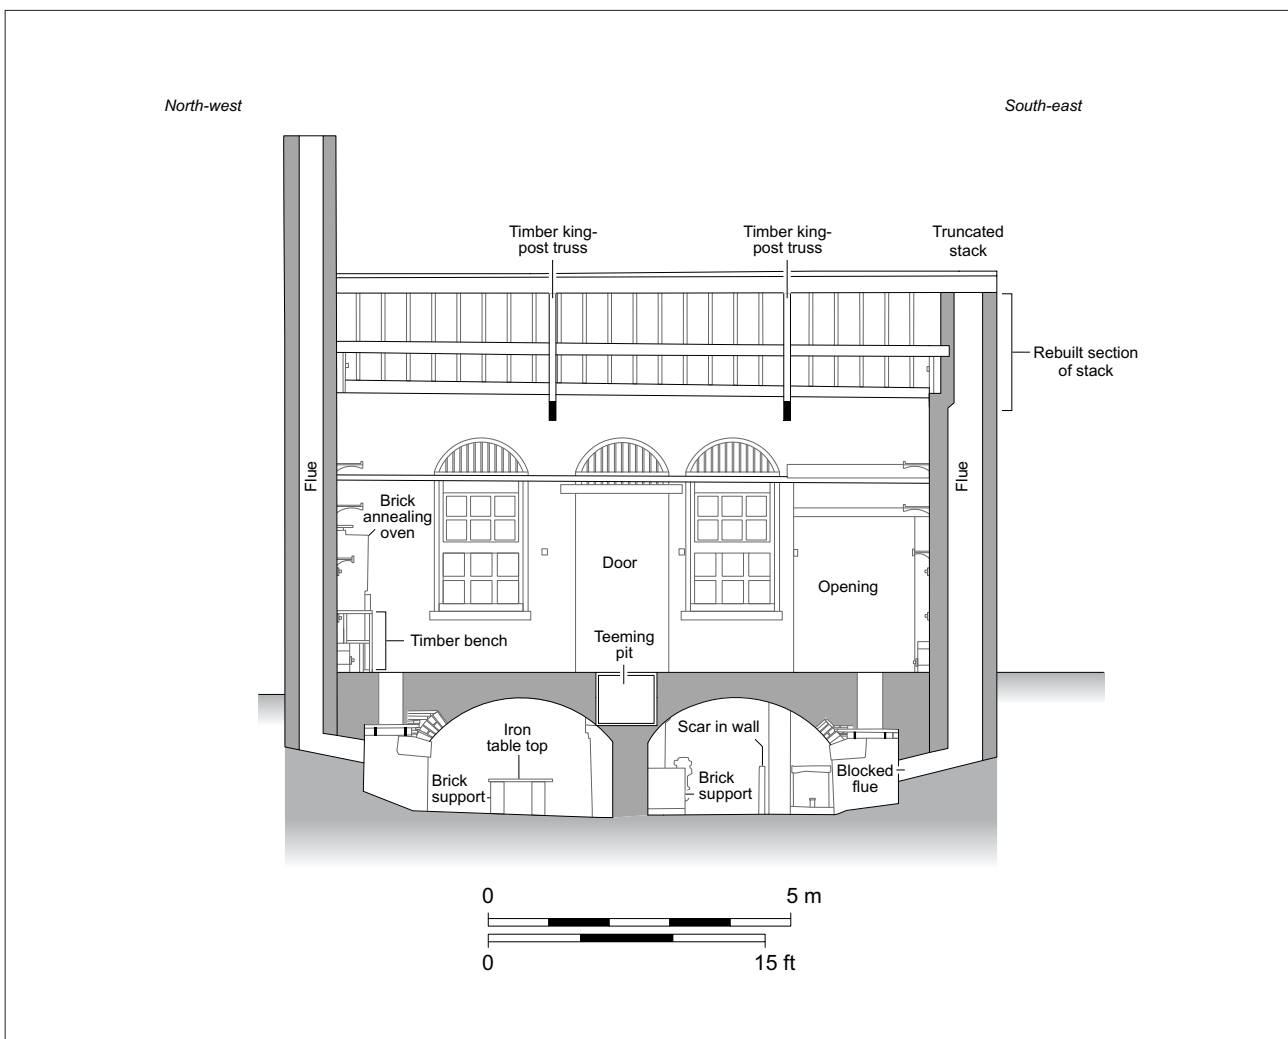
Titanic Works, building recording, south-west facing cross-section of building F1, room G1 and cellar
